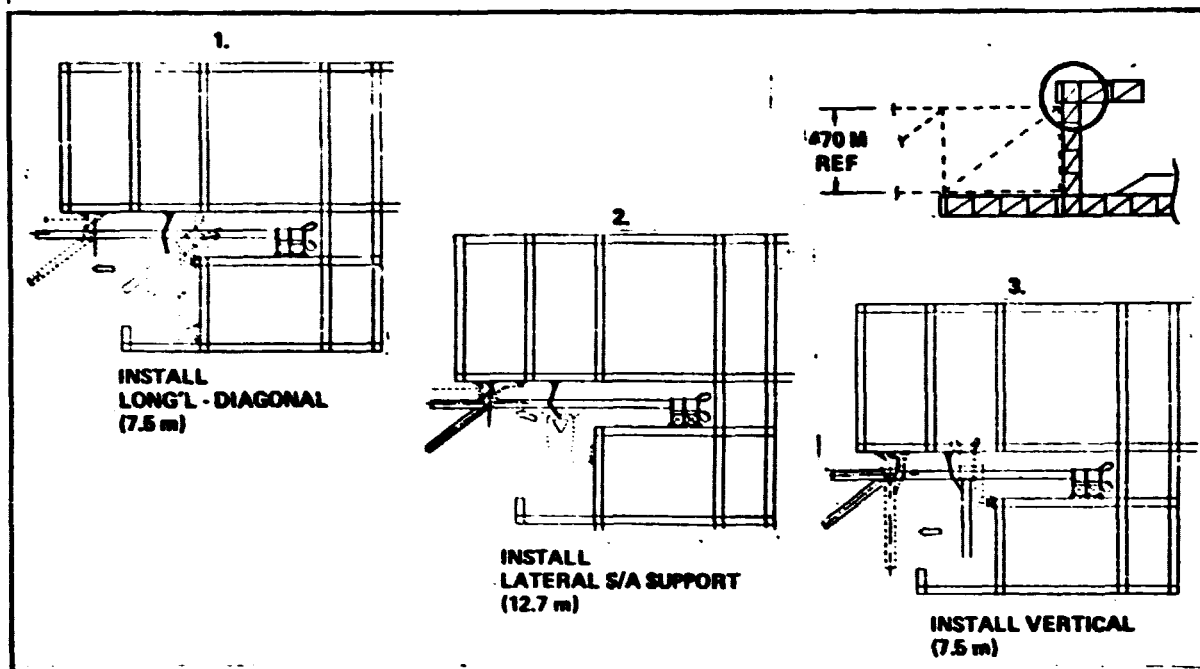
End-Builder Construction Approach (Primary Structure)
